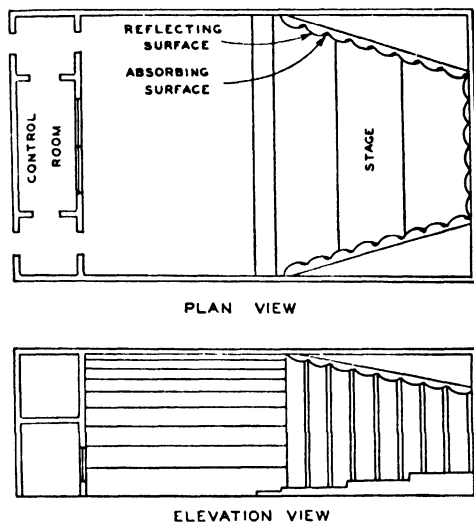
Plan and elevation views of a scoring and recording studio. (After Rettinger.)
